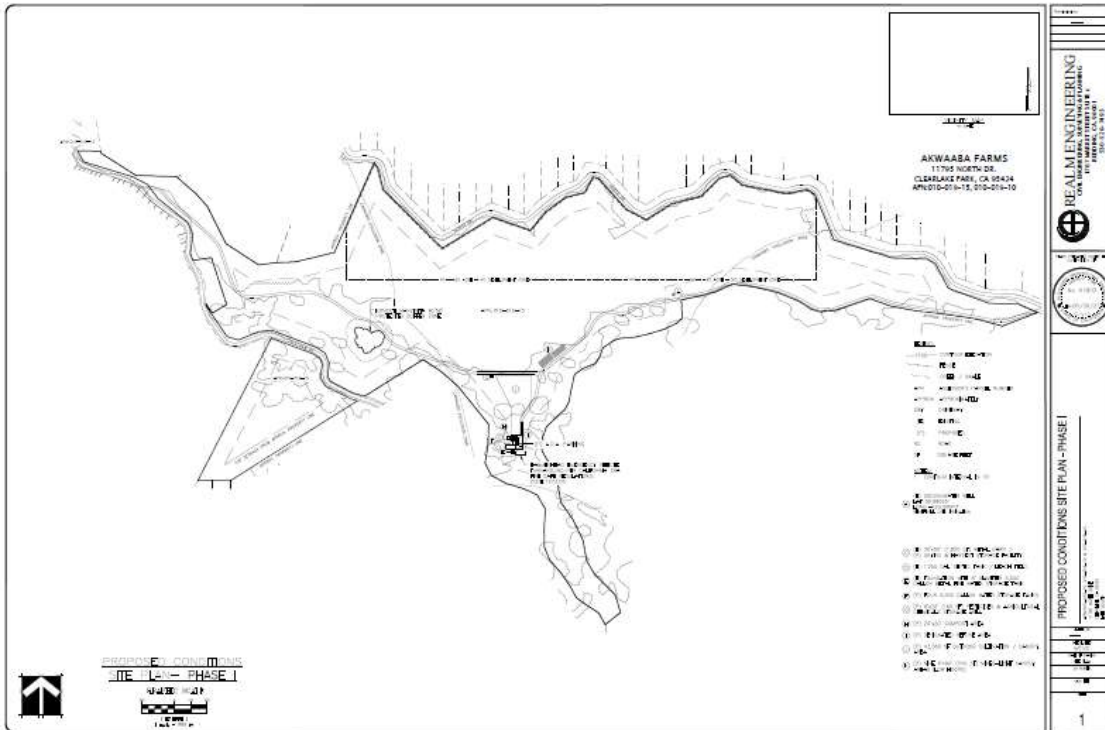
Akwaaba Farms Proposed Conditions Site Plan
